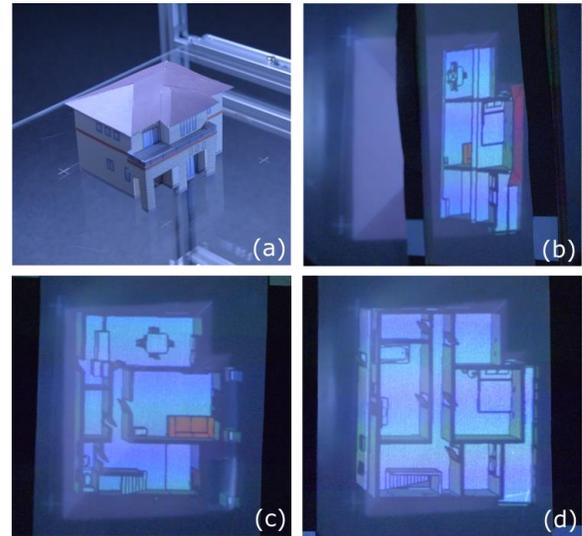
Architectural model. (a) House model. (b) Vertical section view. (c) Cross section view on the first floor. (d) Cross section view on the second floor.
